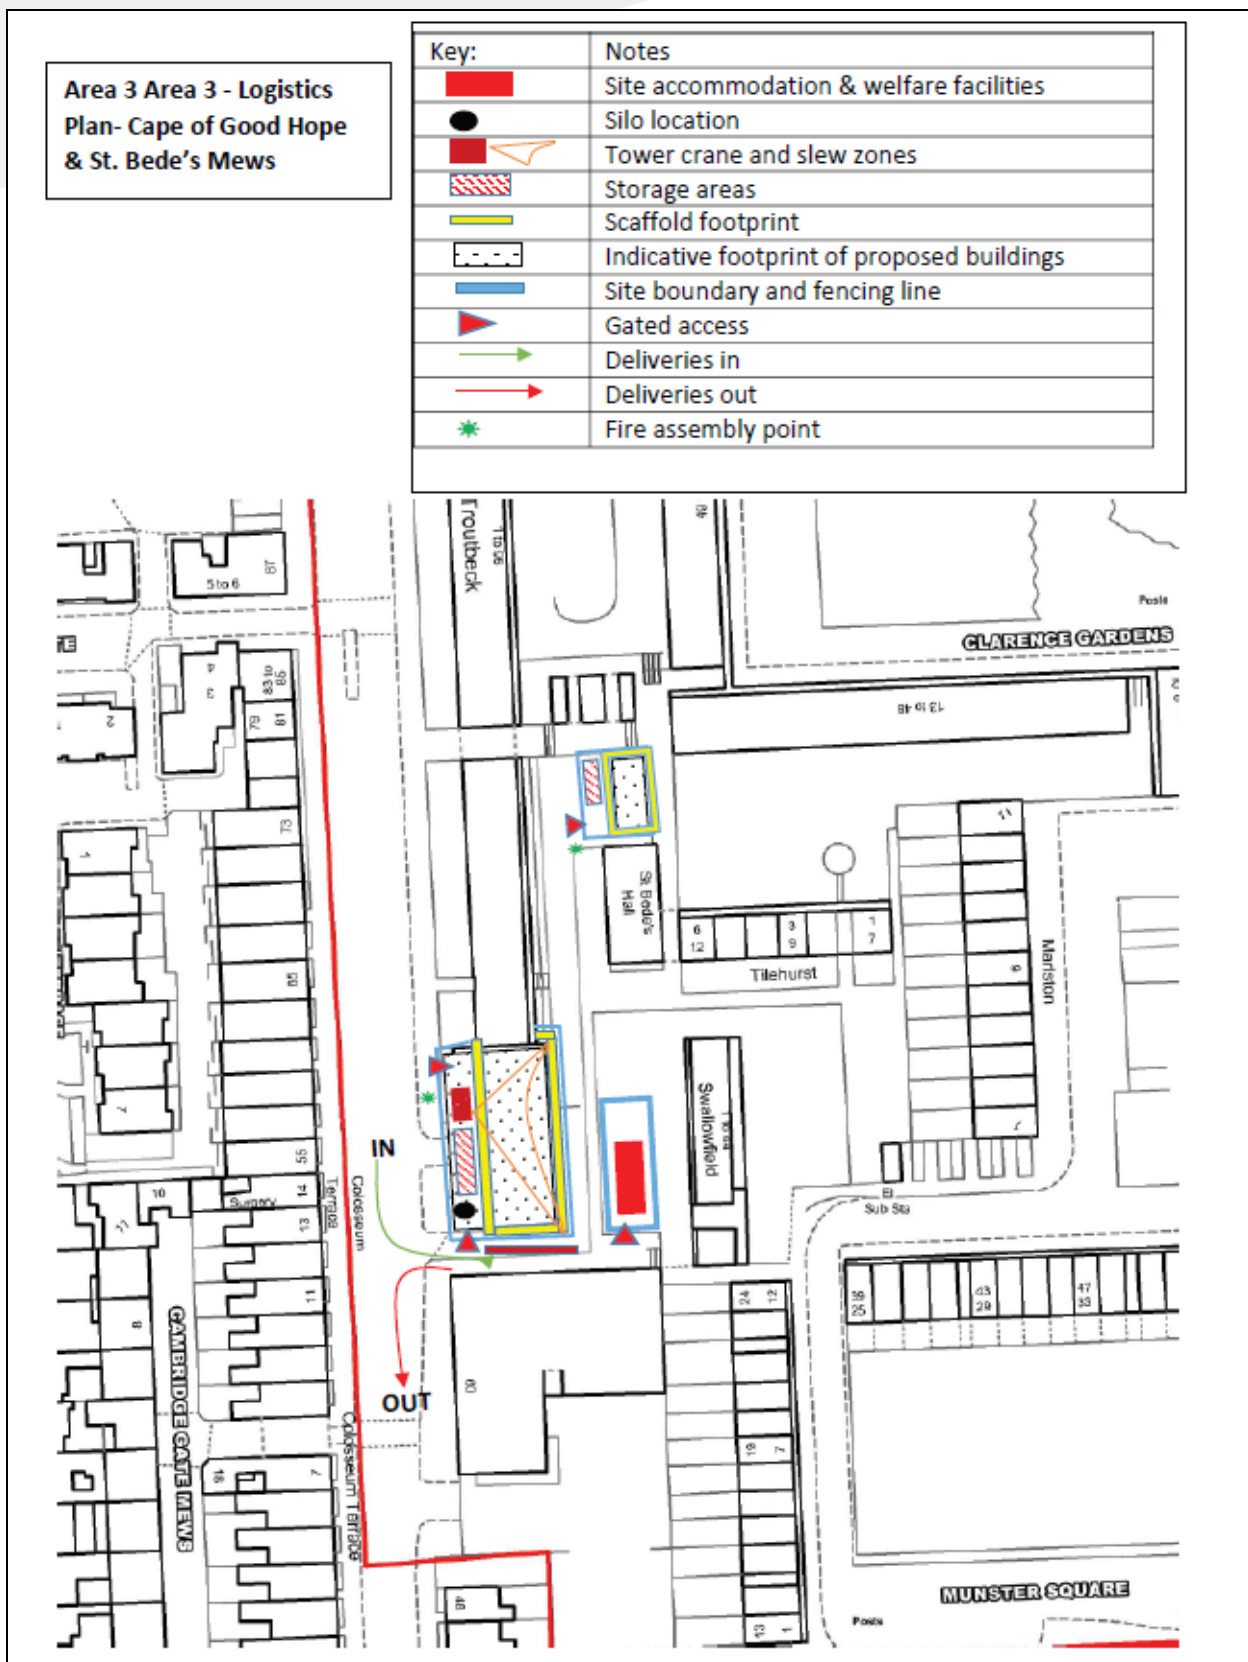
Logistics Plan – Cape of Good Hope and St. Bede's Mews
